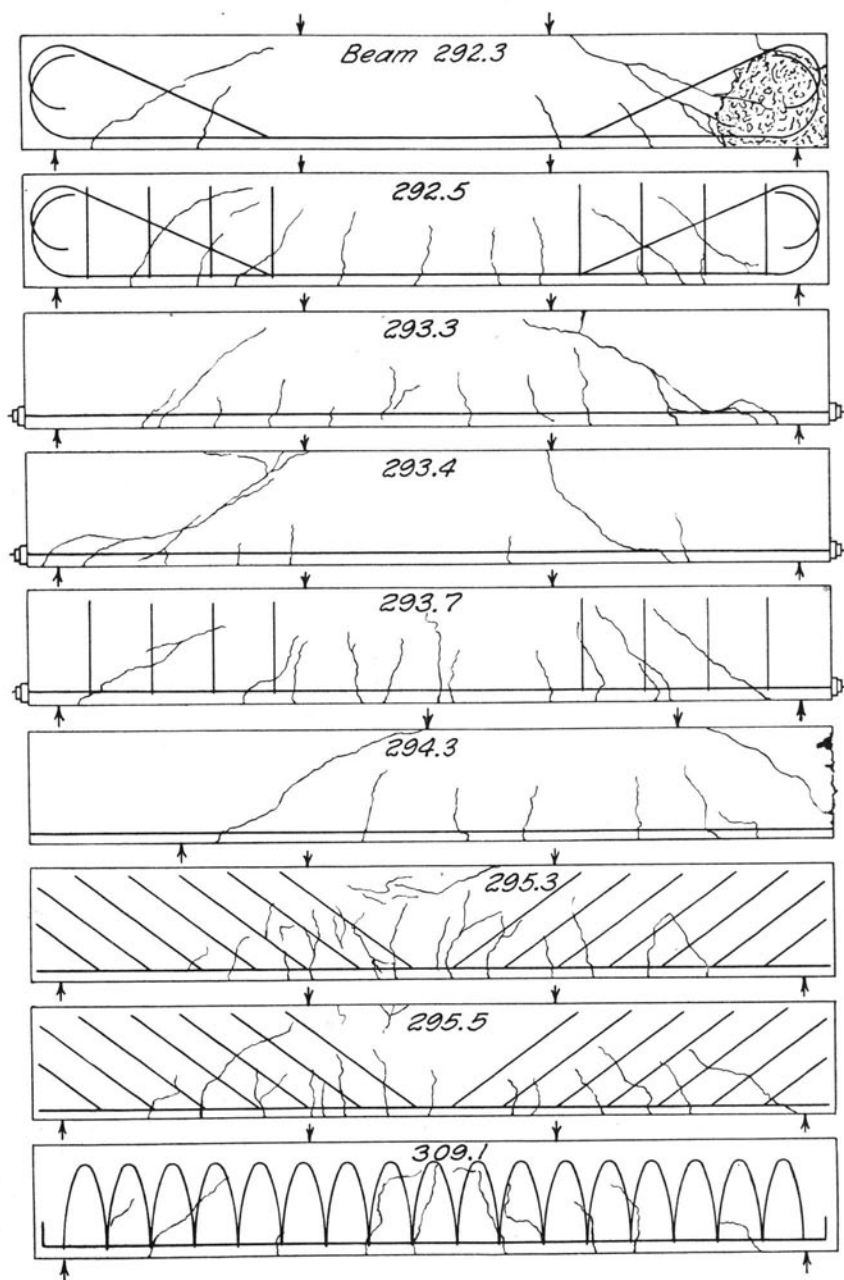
SKETCHES OF TYPICAL BEAMS AFTER FAILURE, SERIES OF 1911
